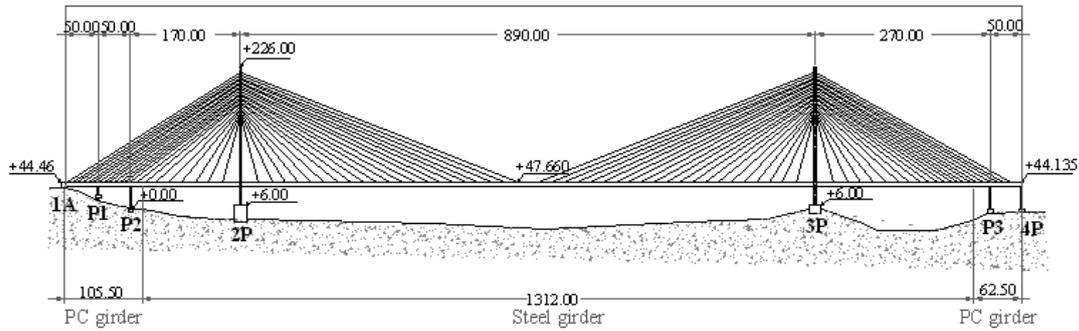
General arrangement of the Tatara cable-stayed bridge
